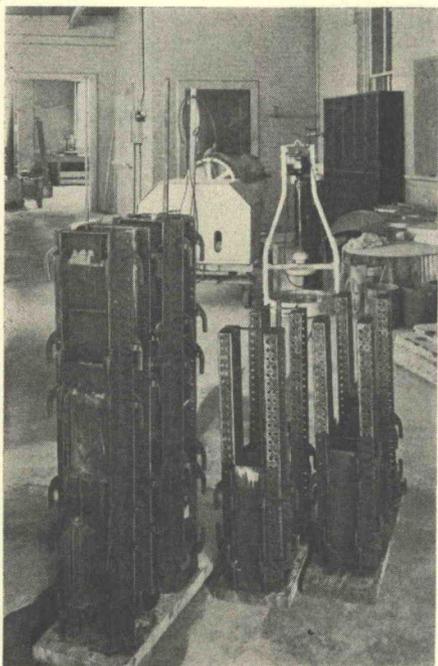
Steel Forms for Beam Type and Pull-Out Specimens
